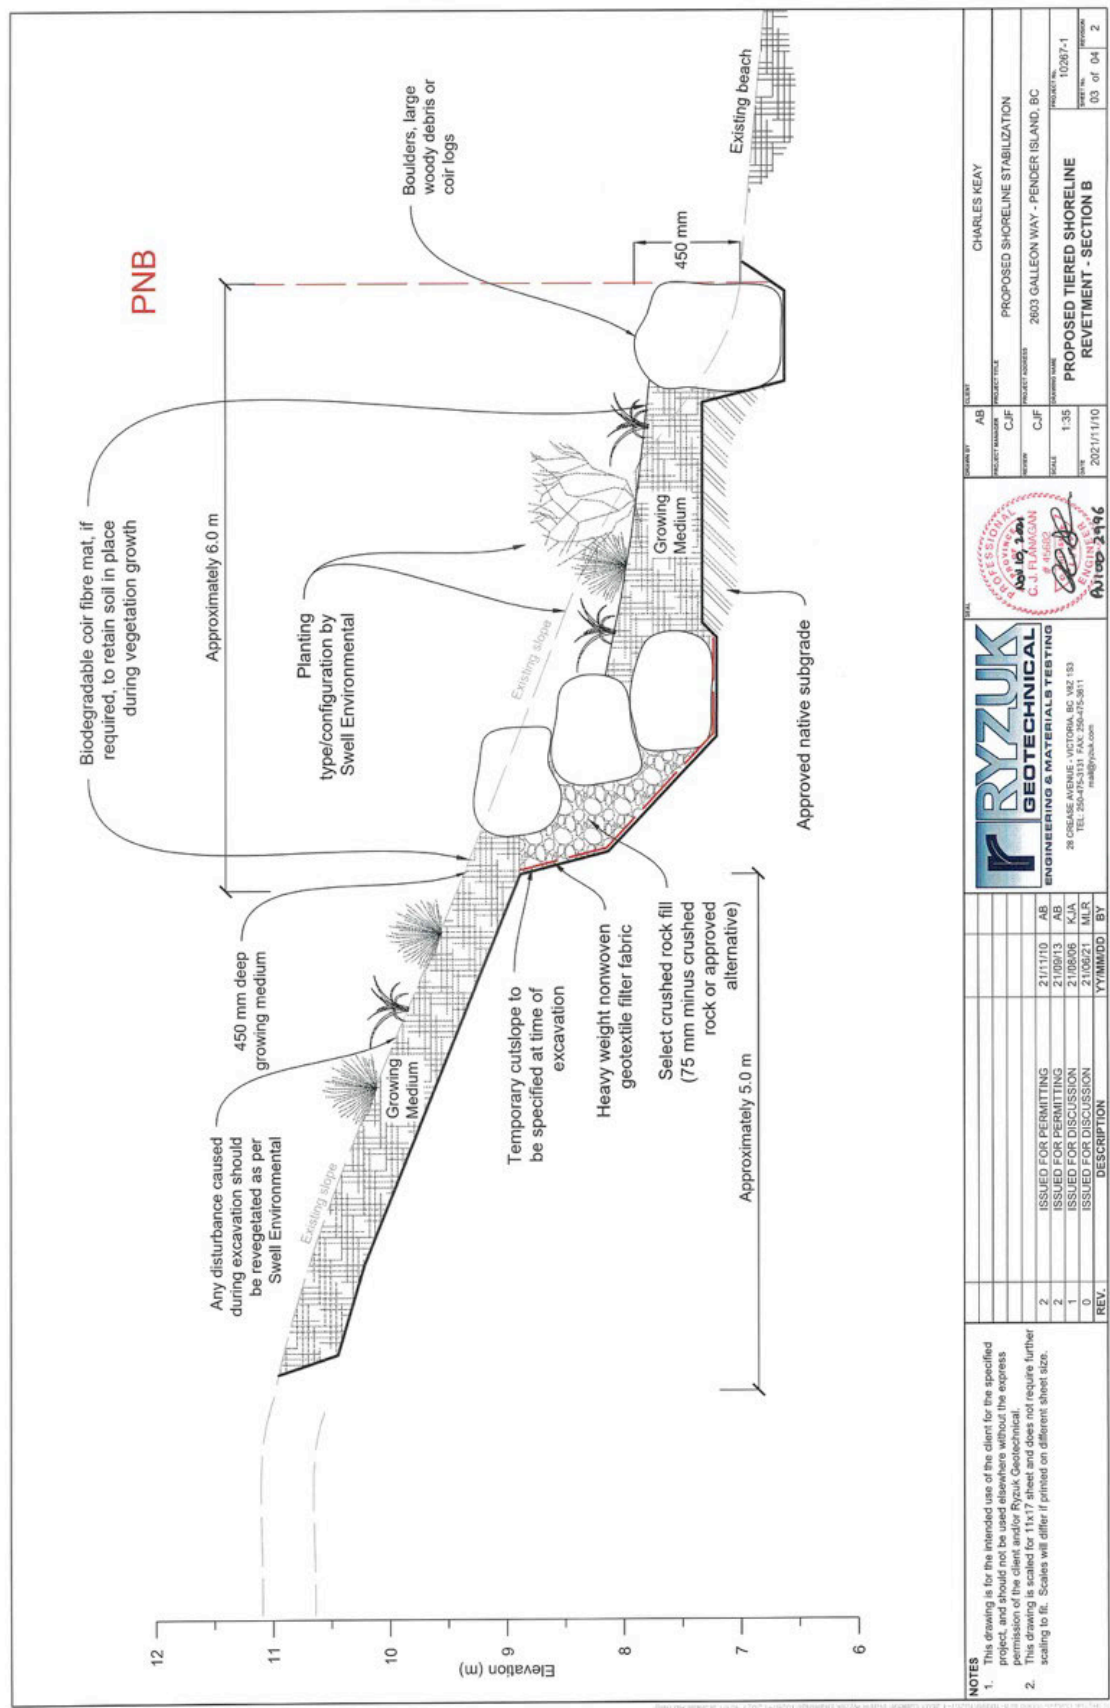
Section B – Shoreline stabilization and planting area adjacent to the yard.
